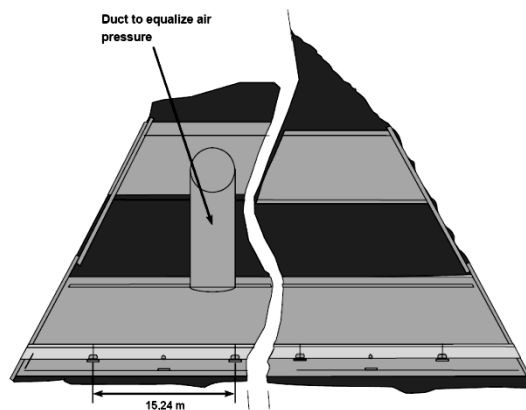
Figure 14. Deep-tunnel elevation – Type B [7]
